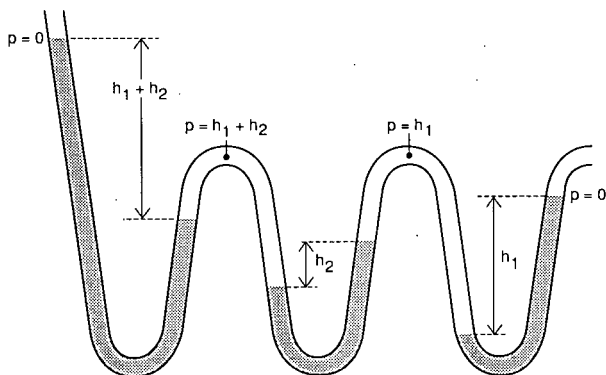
Buildup of overpressure in a drain due to air entrapment
